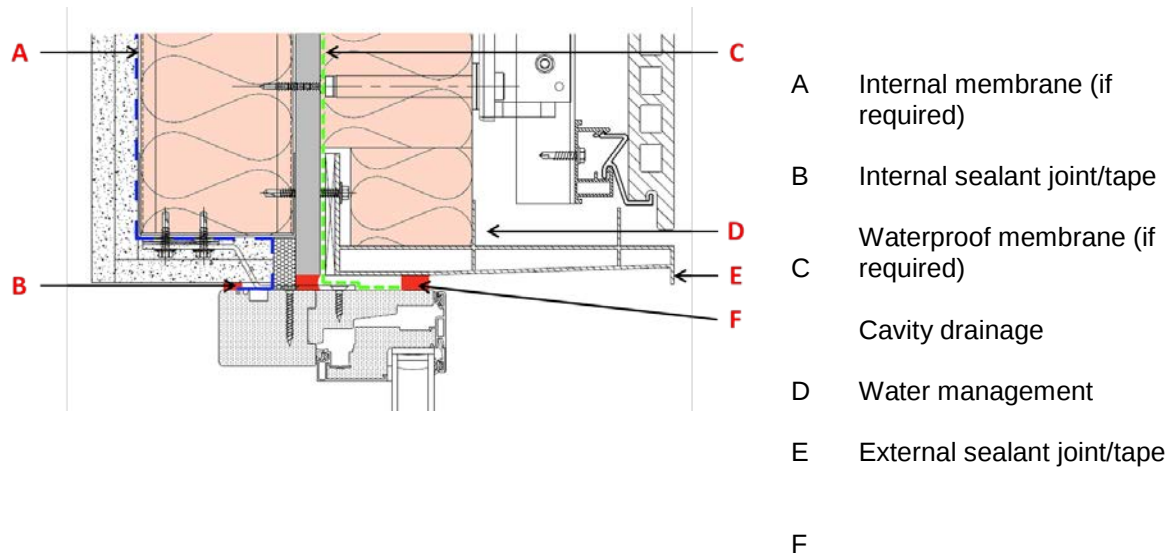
Window pod head interface with rainscreen, framed back wall (insulated)
